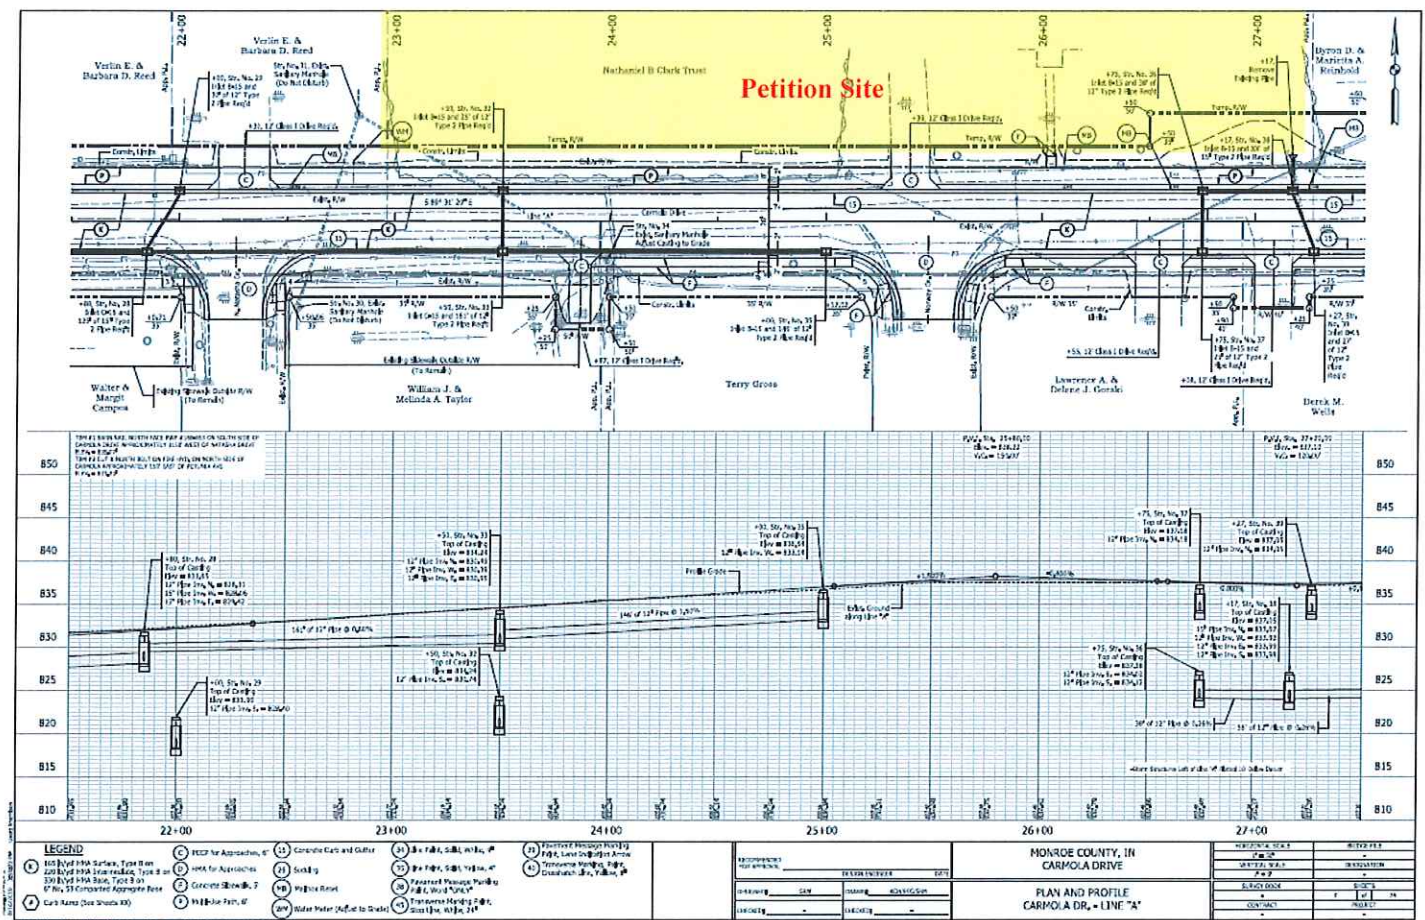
Proposed Carmola DR Improvement Plan
